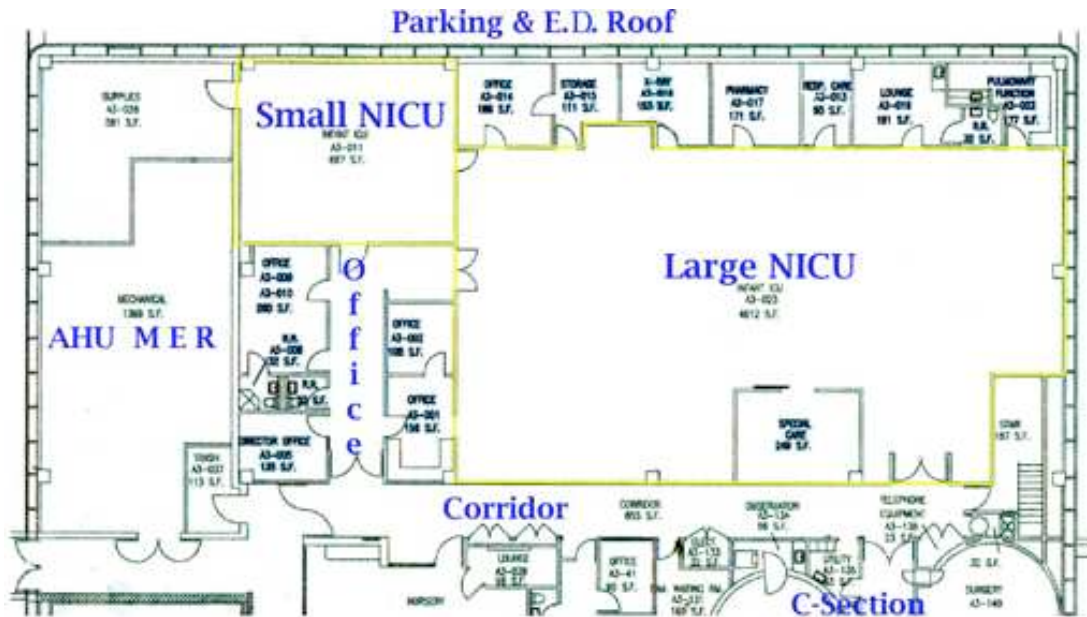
Floor Plan: Existing Large and Small NICU Facilities.
